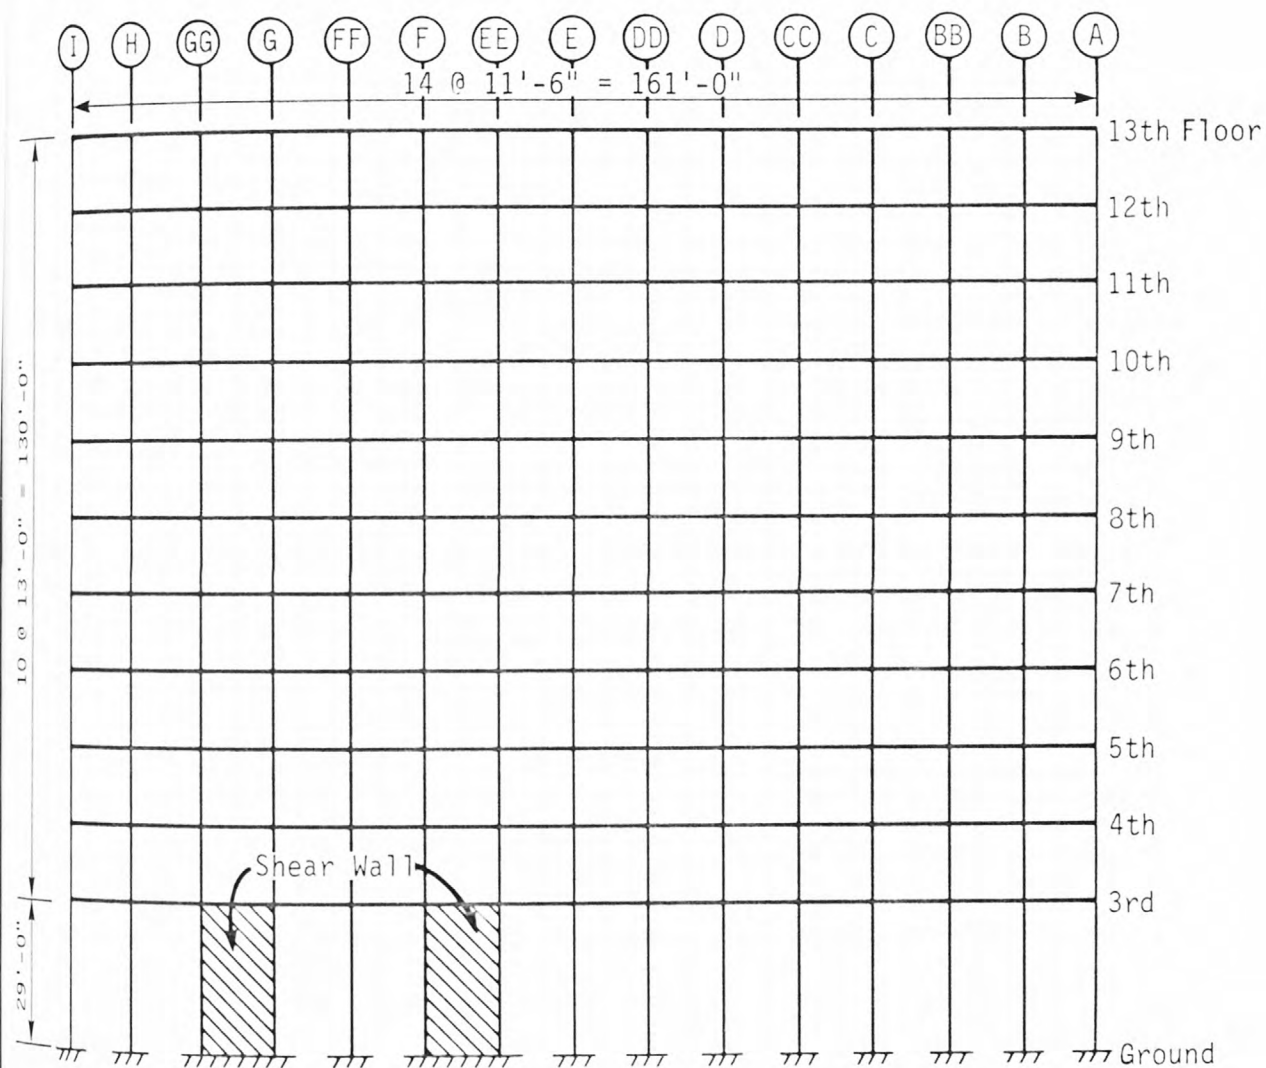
BANK OF CALIFORNIA BUILDING: LONGITUDINAL FRAME ON COLUMN LINE 1
